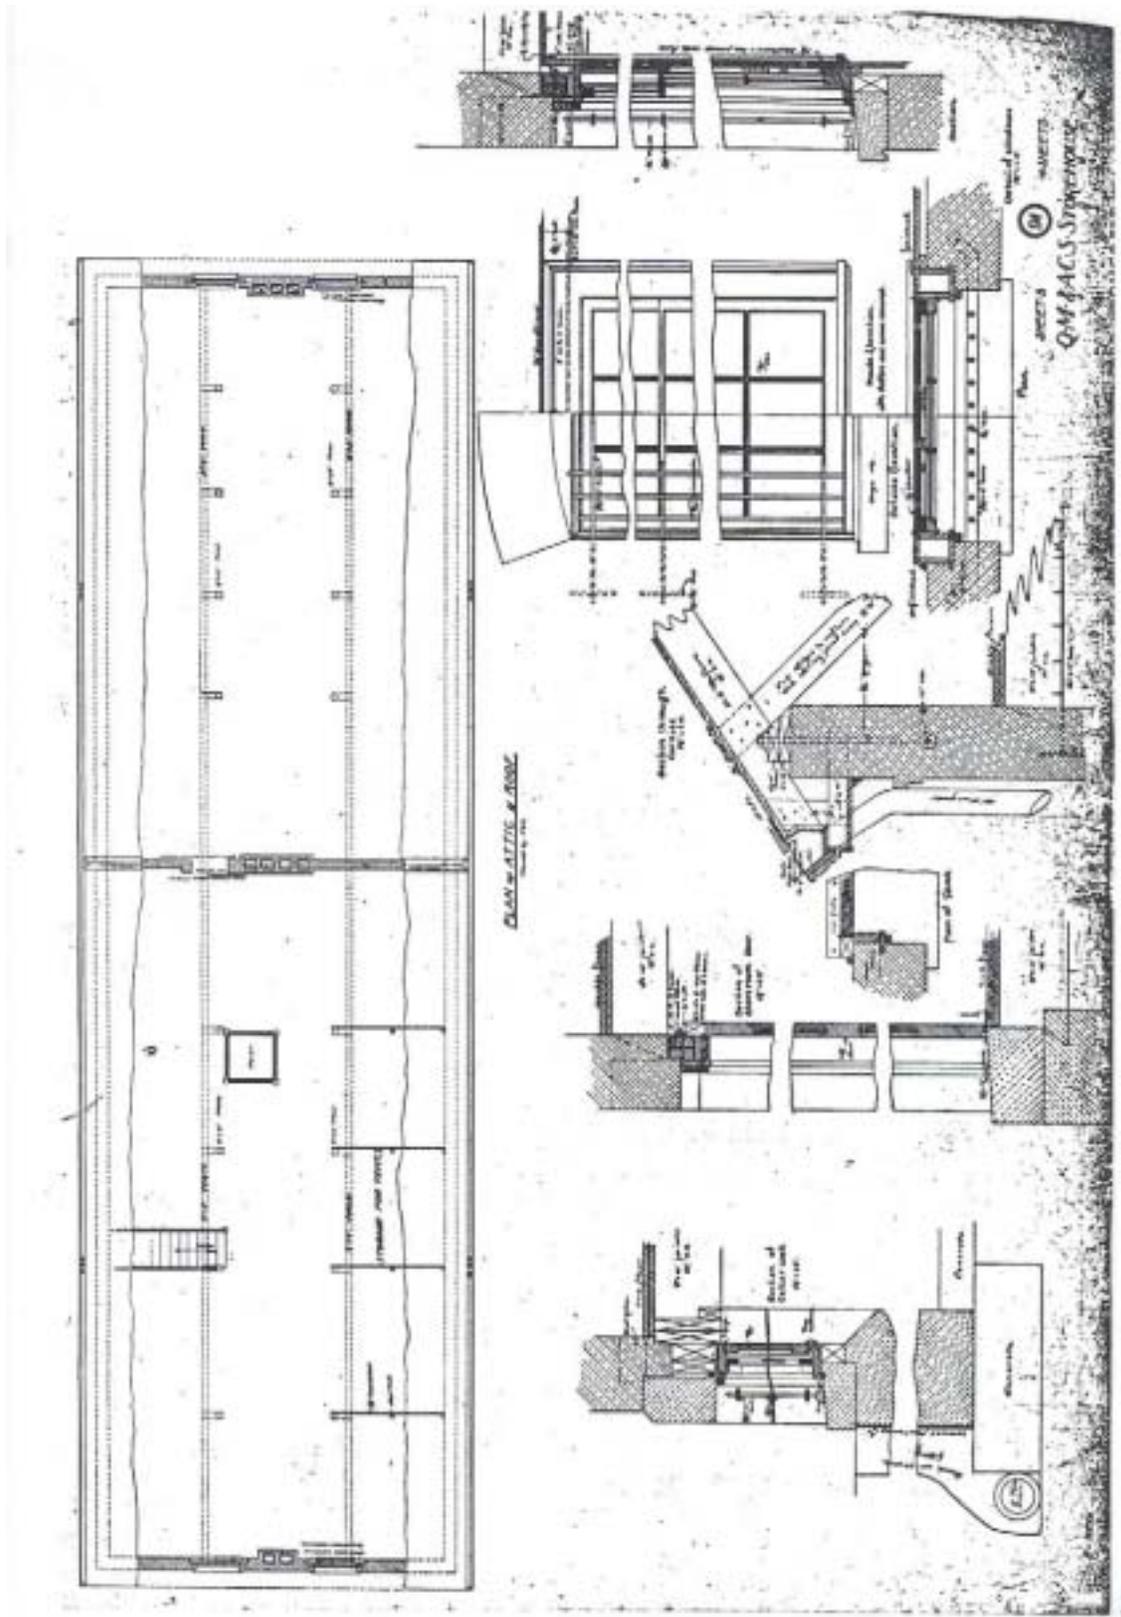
Details, Quartersmaster and Subsistence Storehouse, Plan no. 91, June 1894 [sheet 3 of 4].
